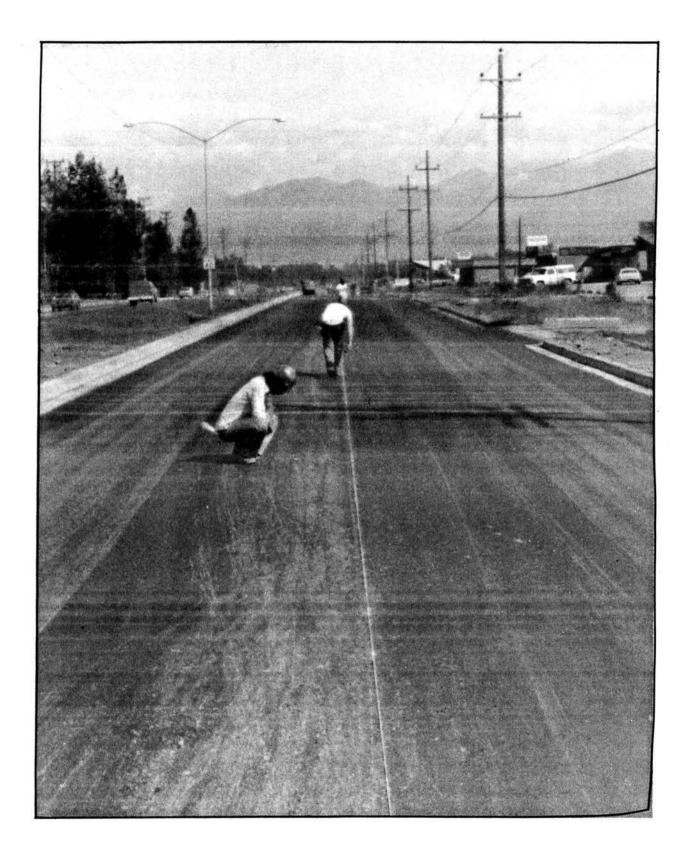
Highly-damaged area at abrupt change in pavement grade (Exit Ramp-Steese Highway).
